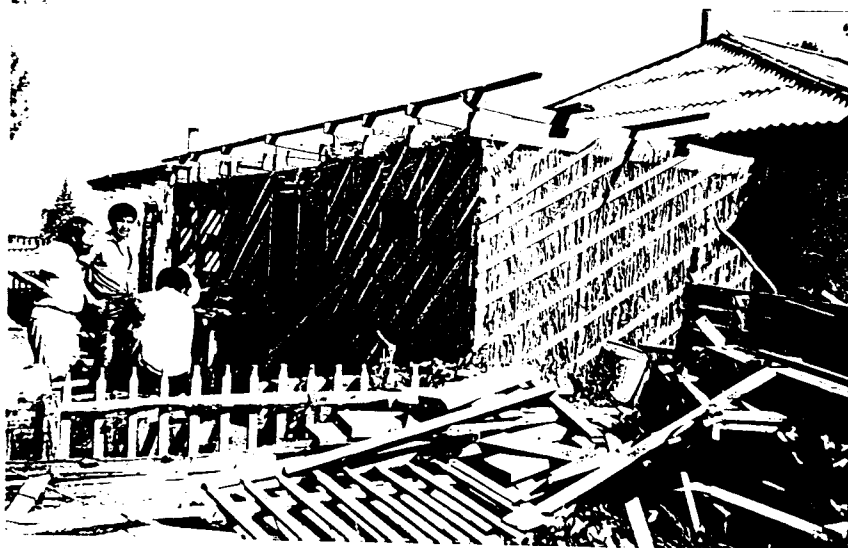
Replacement of partially damaged or collapsed adobe buildings by timber frame construction (Kurtchum; Saisan earthquake 1990, East Kazakhstan)
